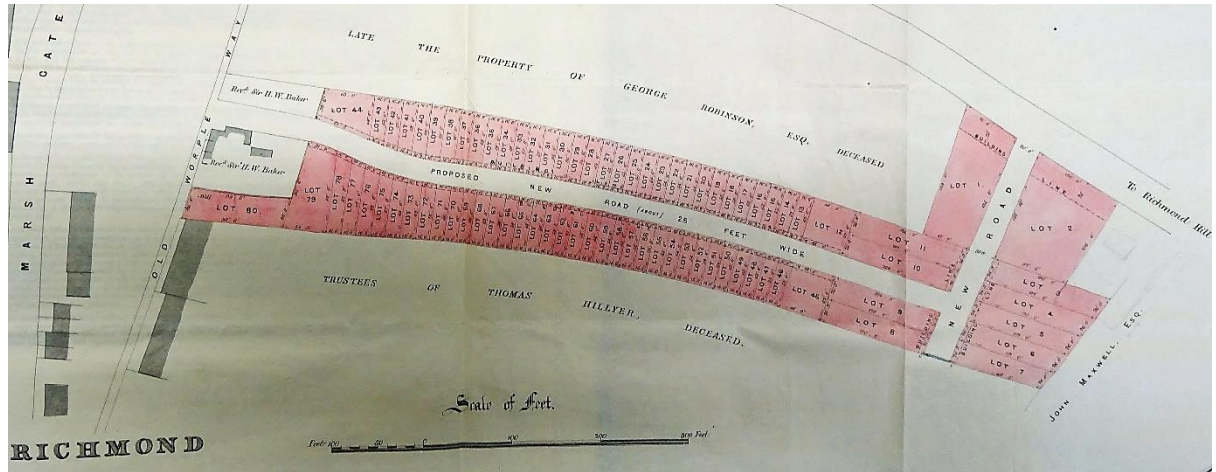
Plan of cottages, 1869. The road became Princes Road.⁸²
